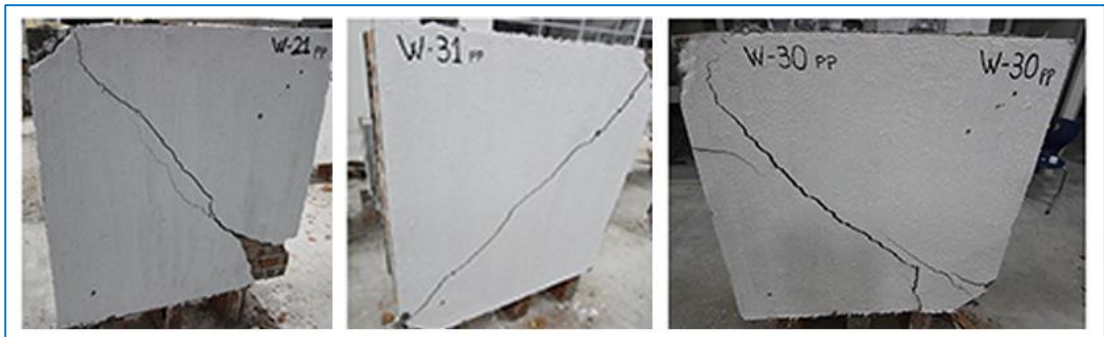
Failure mode of polypropylene reinforced mortar strengthened wall panels of Series 2.
